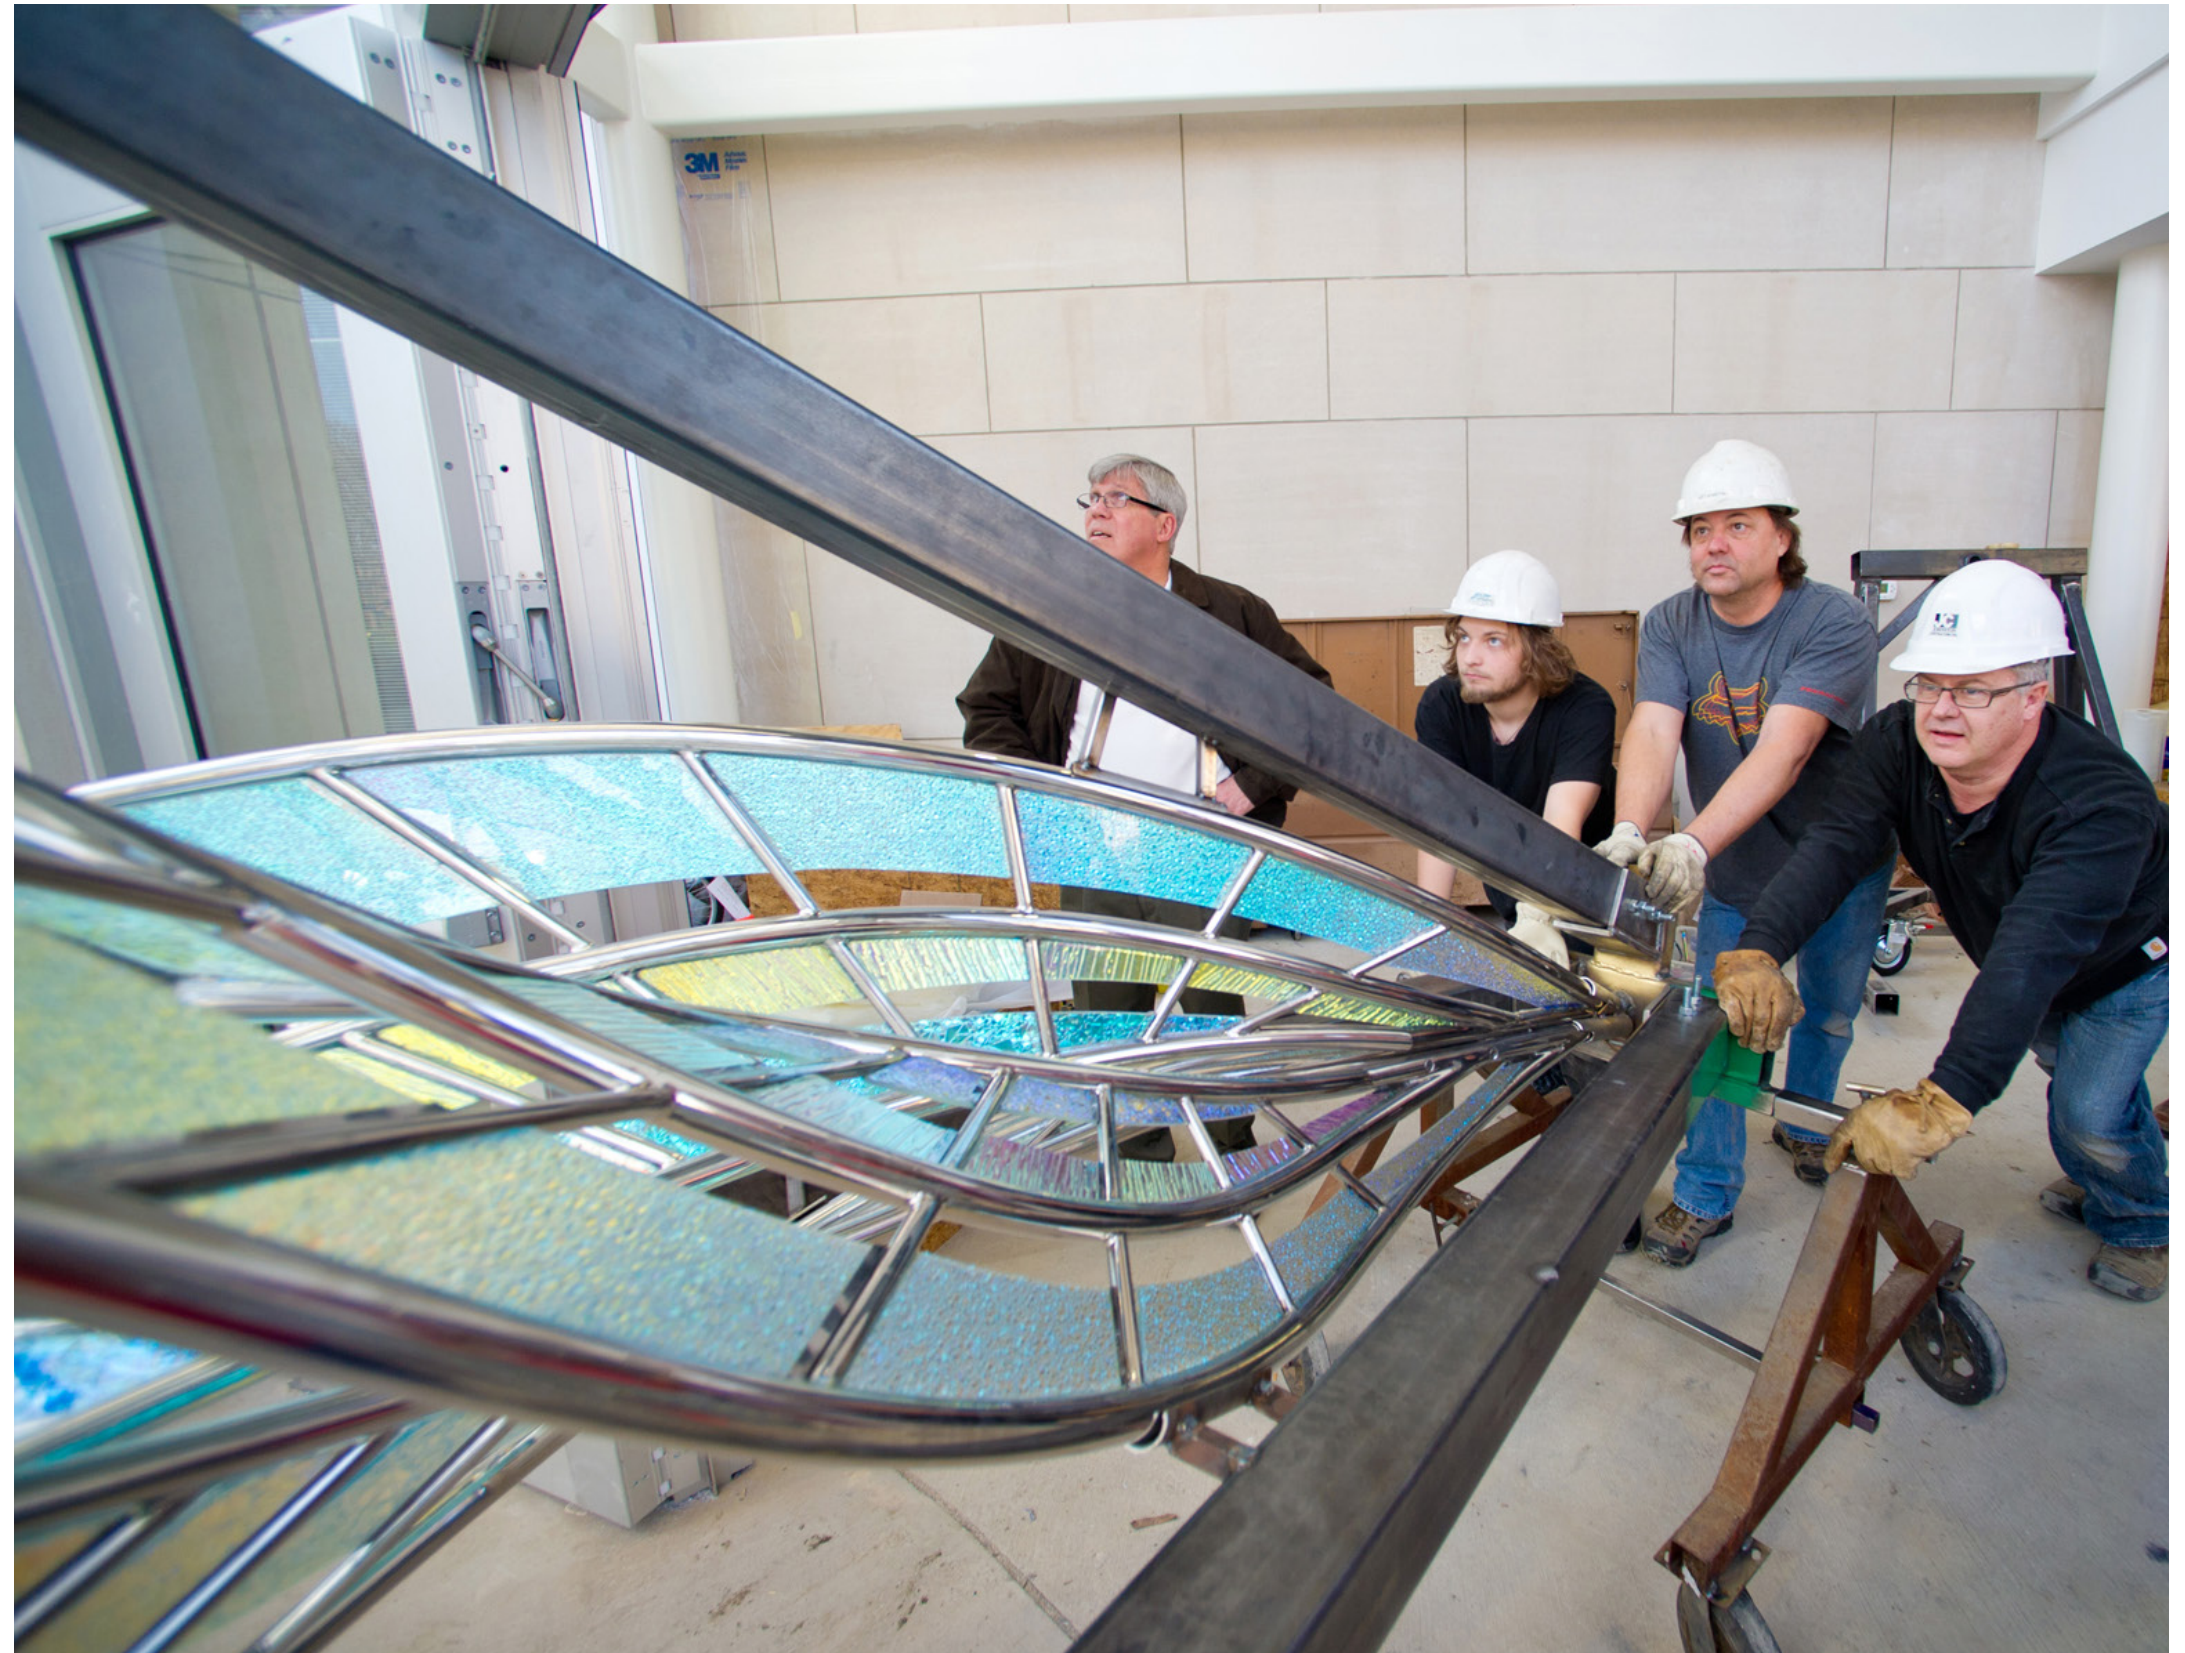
Installing dichroic glass in IWU Helix. Photo: Glass and Steel Sculpture
